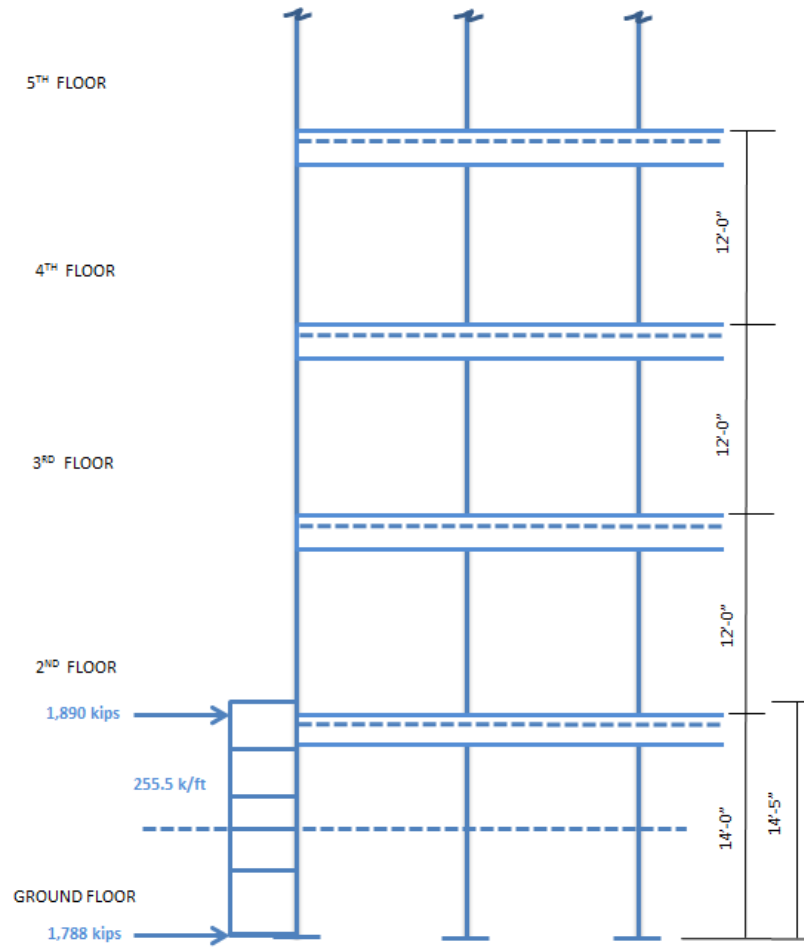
LC2 Tsunami loads on overall Monterey office building
